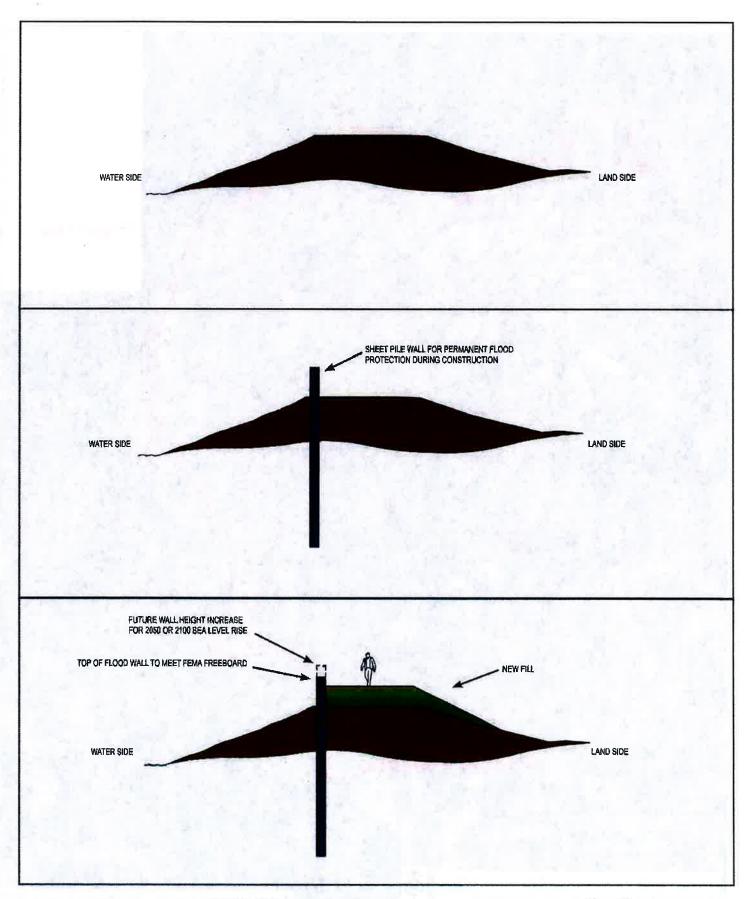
Typical Sheet Pile Flood Wall Cross Section
